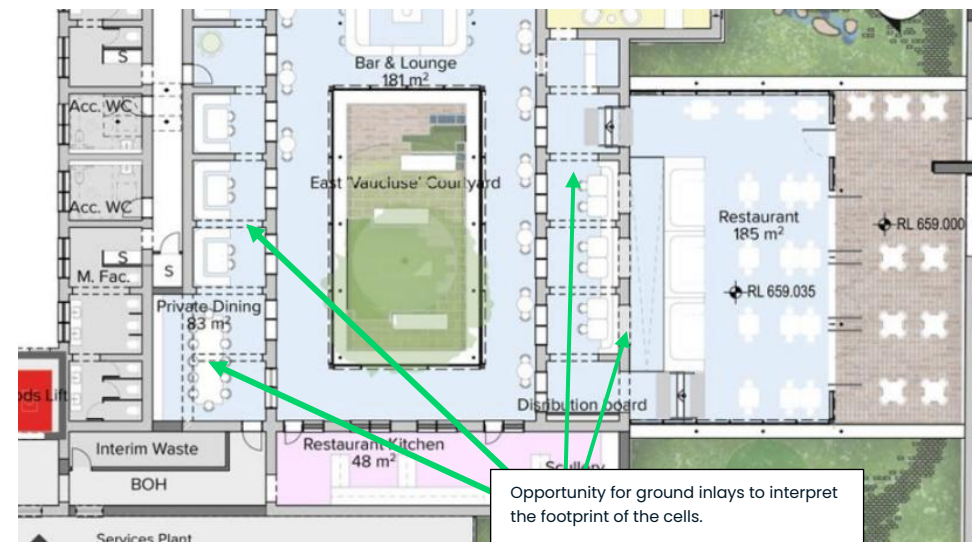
Detail from proposed ground floor plan showing the restaurant and bar area.
